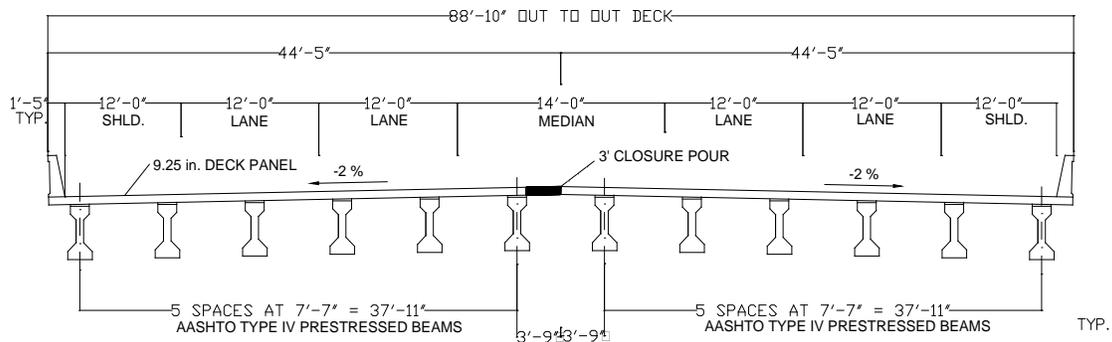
Elevation of Beaver Creek Bridge showing deck and girders.
